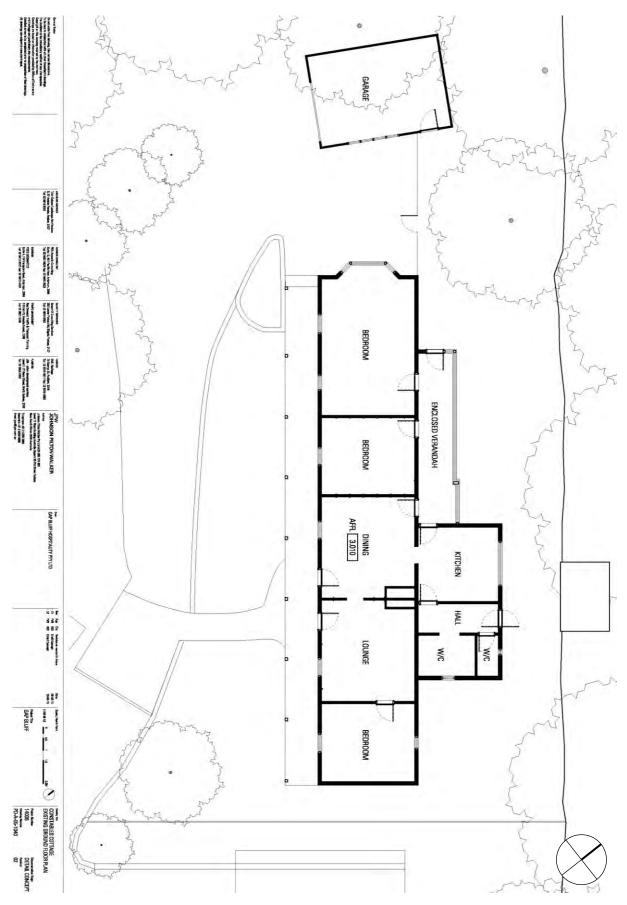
Floor plan, Constable's Cottage. (Source: JPW 2015)
